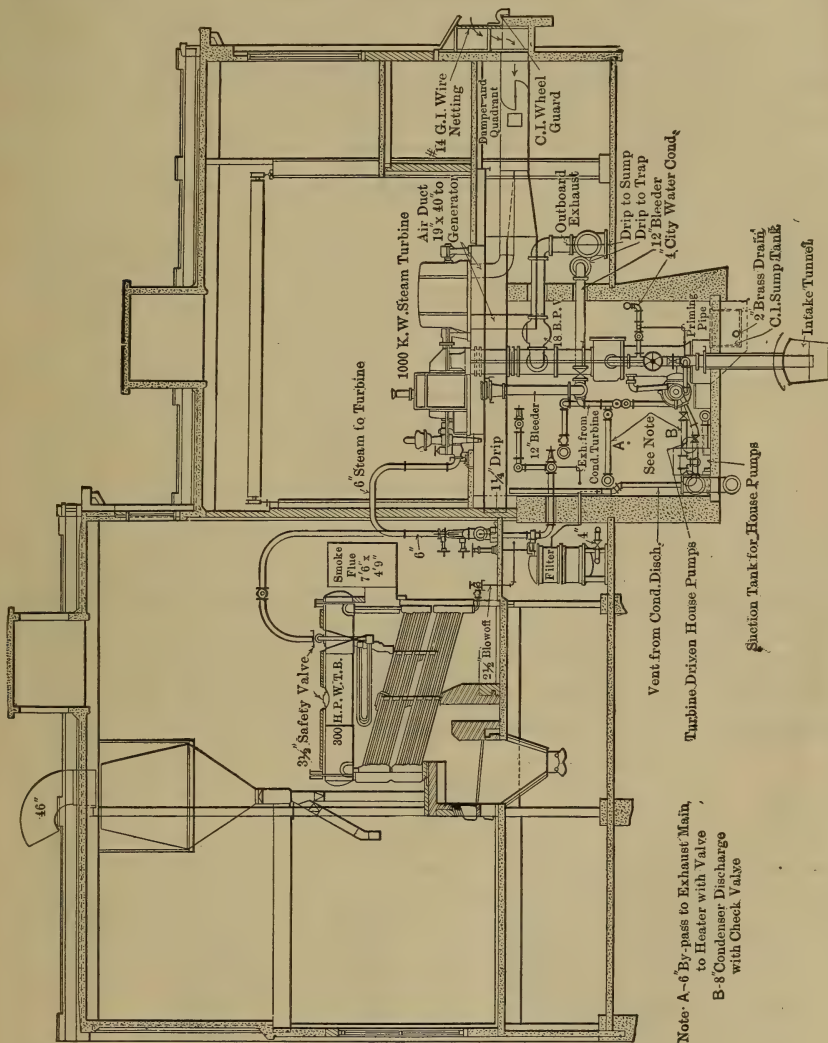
Sectional Elevation through Boiler and Engine Room, showing Steam Piping and Condenser Connections.
